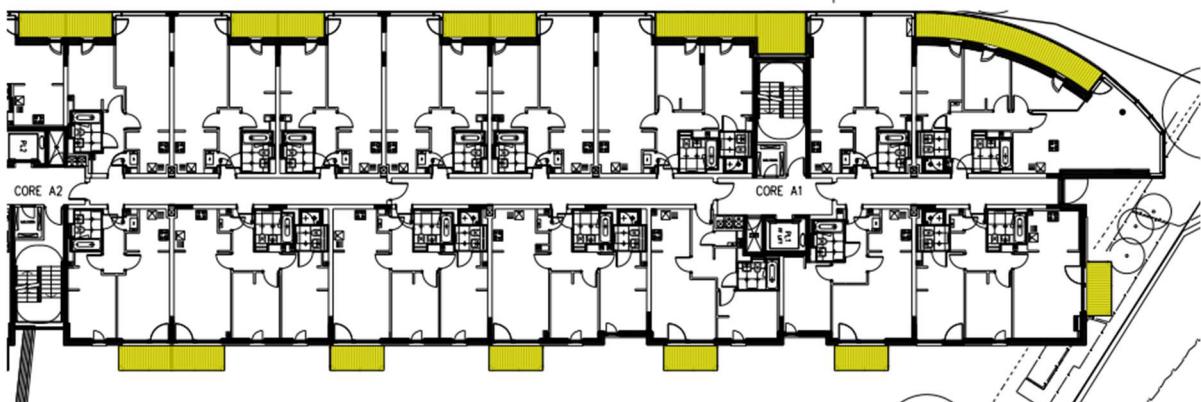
Typical floor plan highlighting the recessed balconies (West Elevations, top of the plan) and projecting balconies (East Elevations, bottom of the plan)
